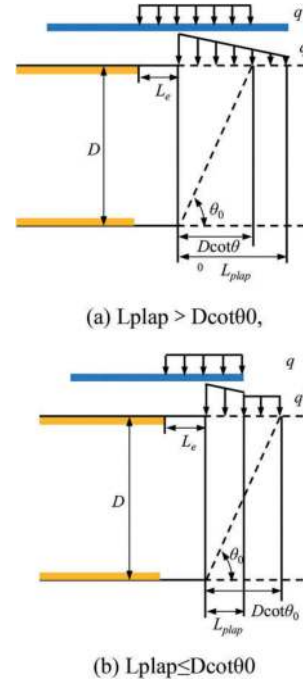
Force analysis of the tunnel face reinforced with pipe roof.
